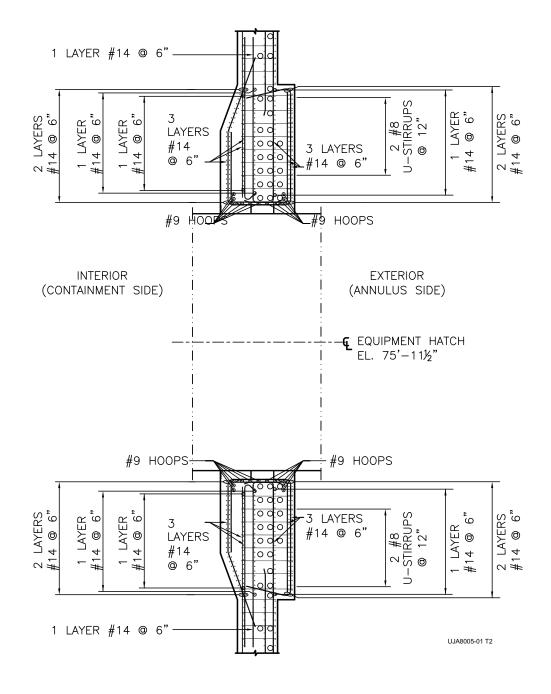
E.1-13—Reinforcement Pattern for Section 2-2 of the Equipment Hatch Area
